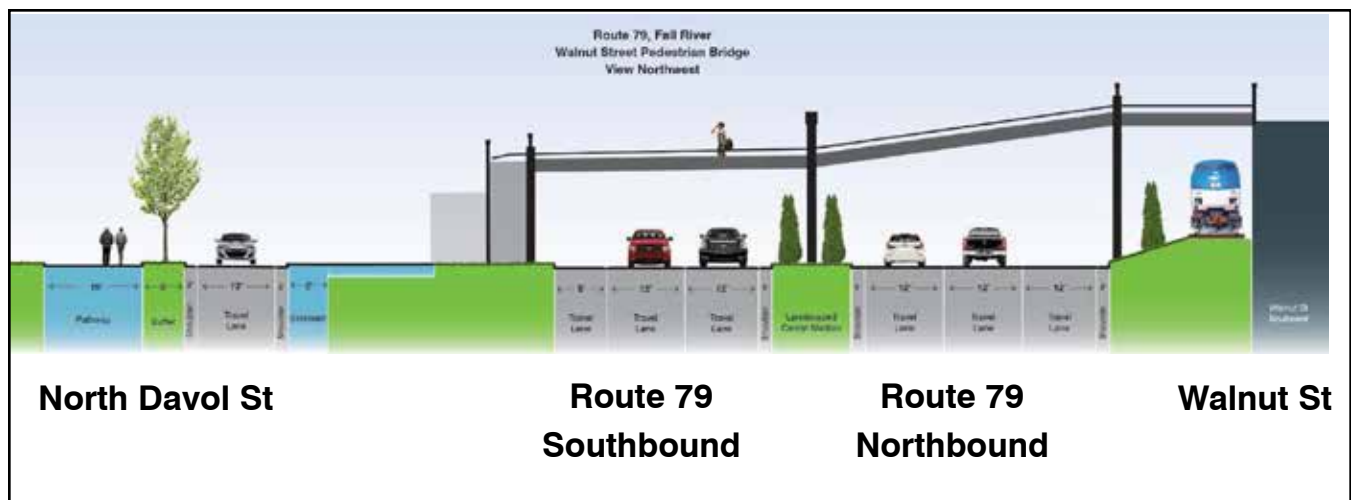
Concept for Walnut Street Pedestrian Bridge
